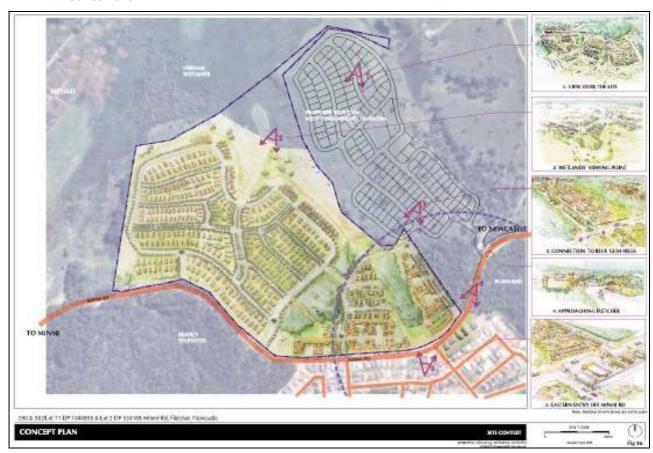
Amended Concept Plan (August 2006) – refer Appendix C
